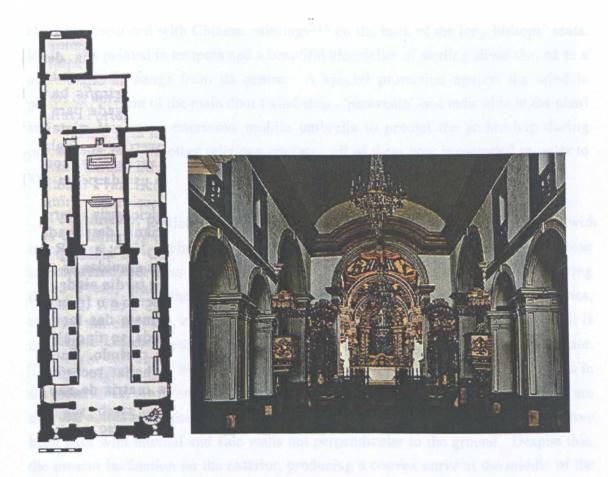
plan and view of the interior of Mariana's Cathedral ²¹³
